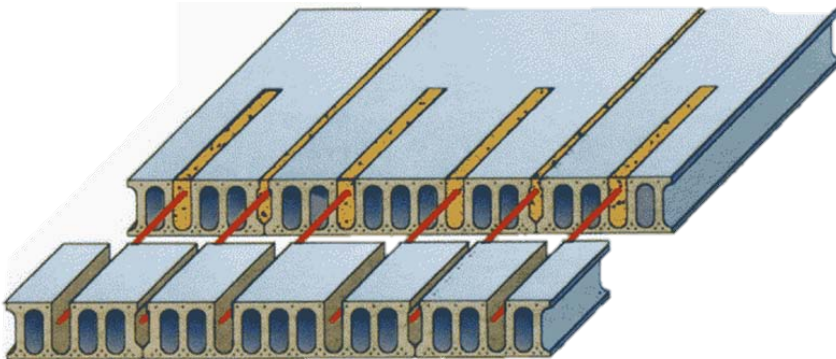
Reinforcement in joints and voids for slabs without concrete topping (AIDEPLA)
